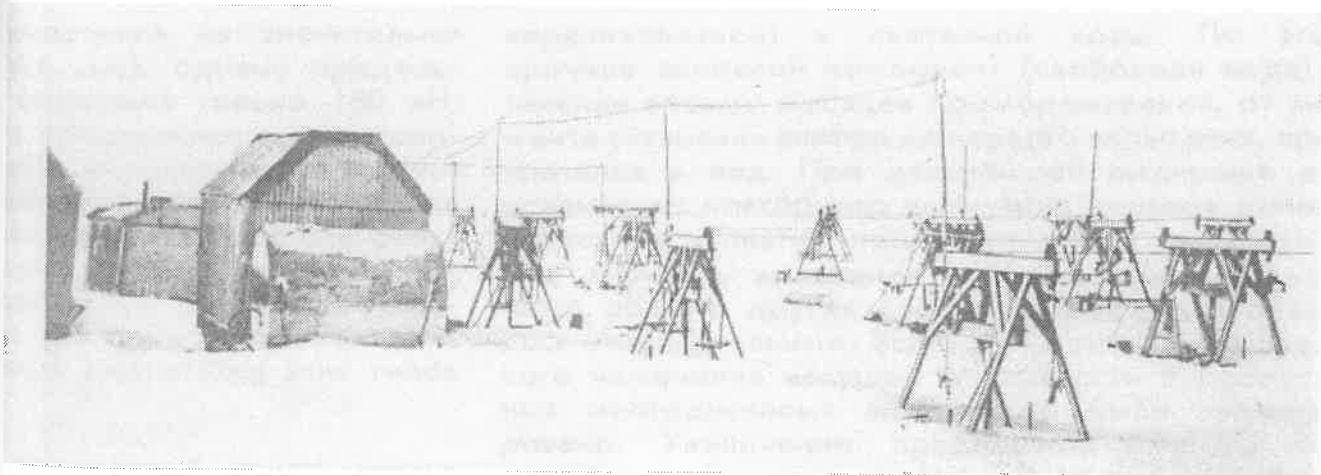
Frozen-in anchor field at test site No.1, Bovanenkovskoye GCF
